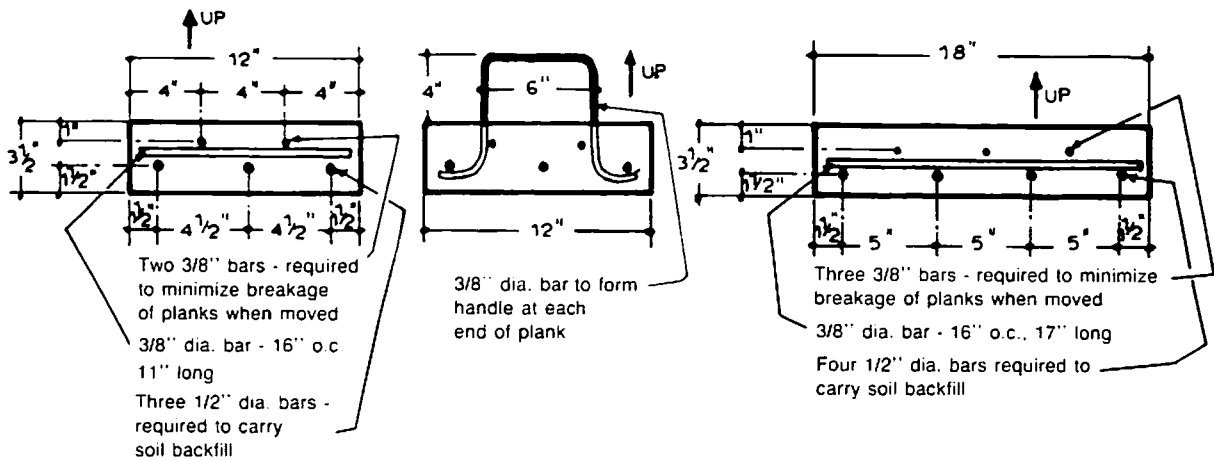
Detailed views of concrete planks used to form disposal pit cover.
